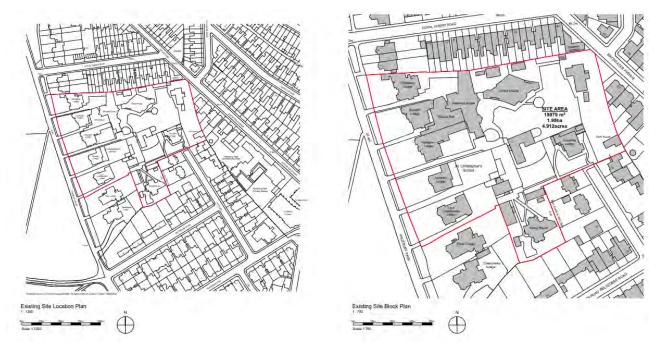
Site location and existing site block plan as submitted by applicant under application reference 22/01221/F
